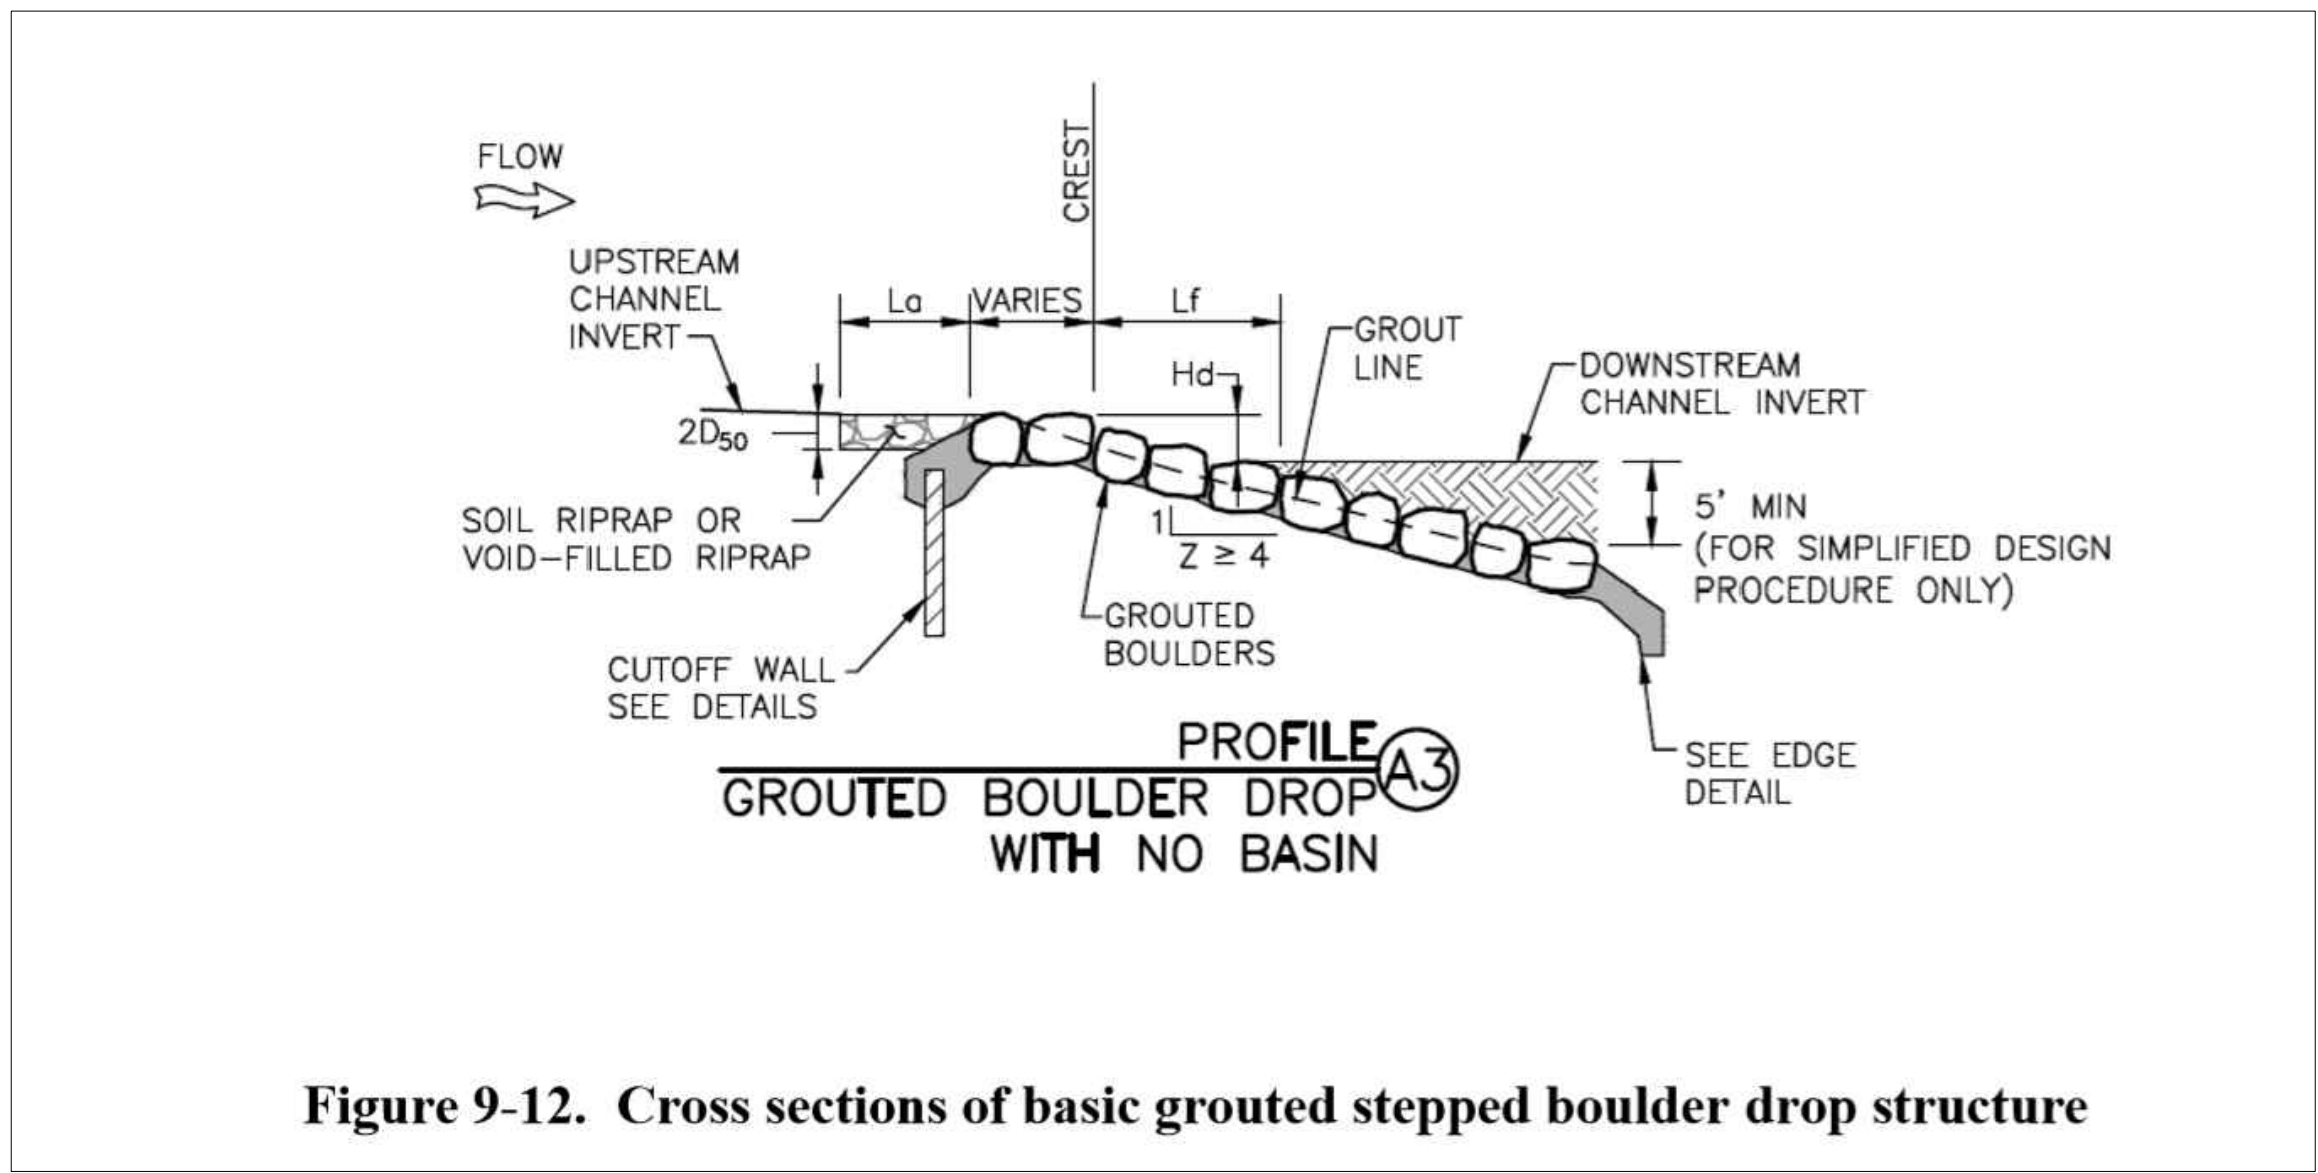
Cross sections of basic grouted stepped boulder drop structure
